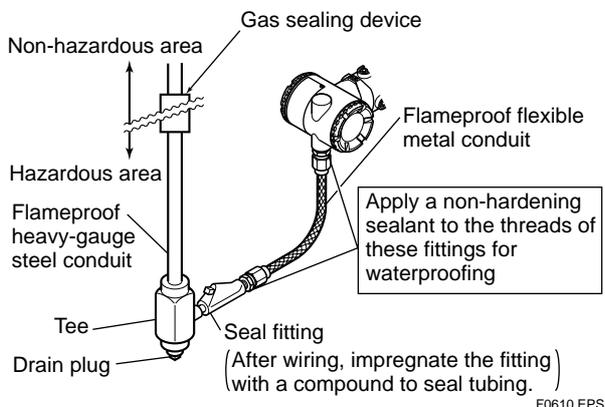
Typical Wiring Using Flameproof Metal Conduit
